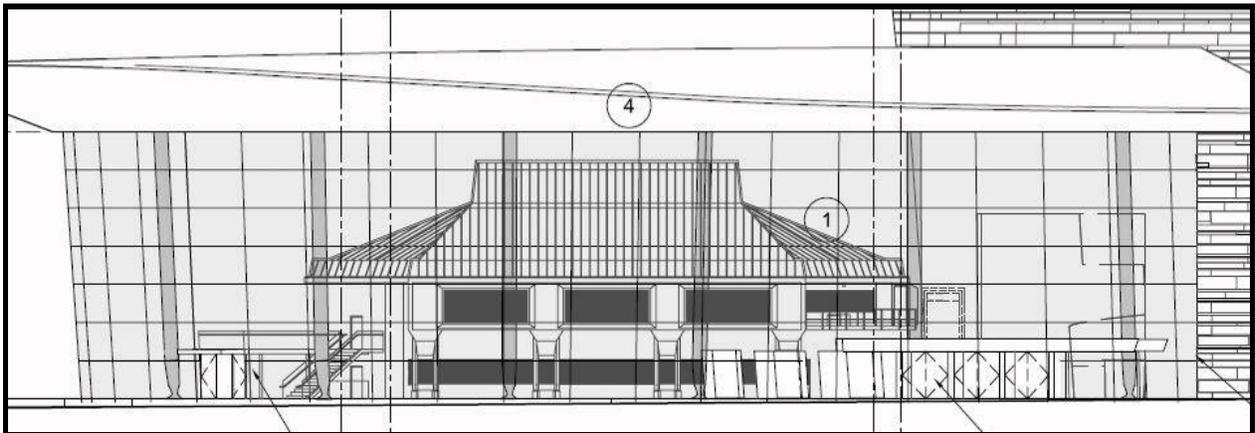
Architectural Elevation showing the faces of the façade with glazing runs at 7 frames high
